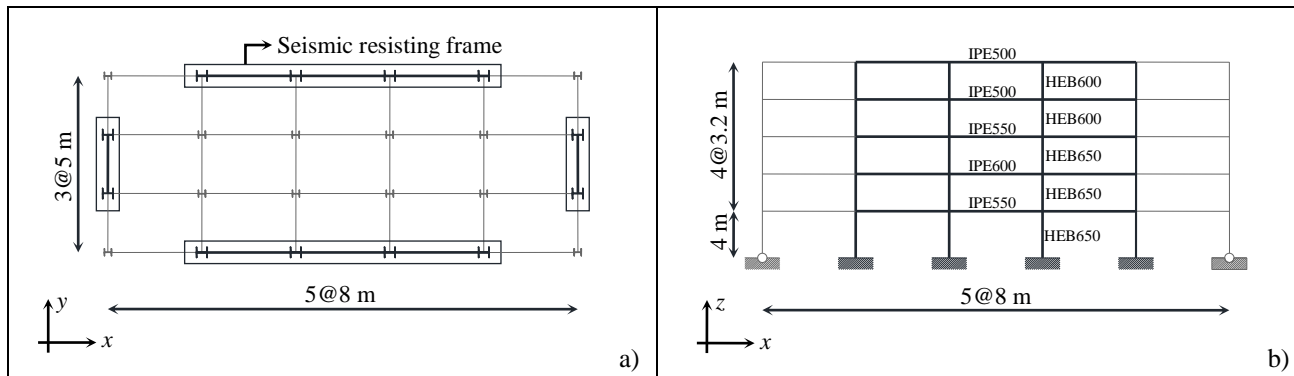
a) Plan view; b) elevation view of the prototype building and dimensions of structural elements of the SC-MRF
